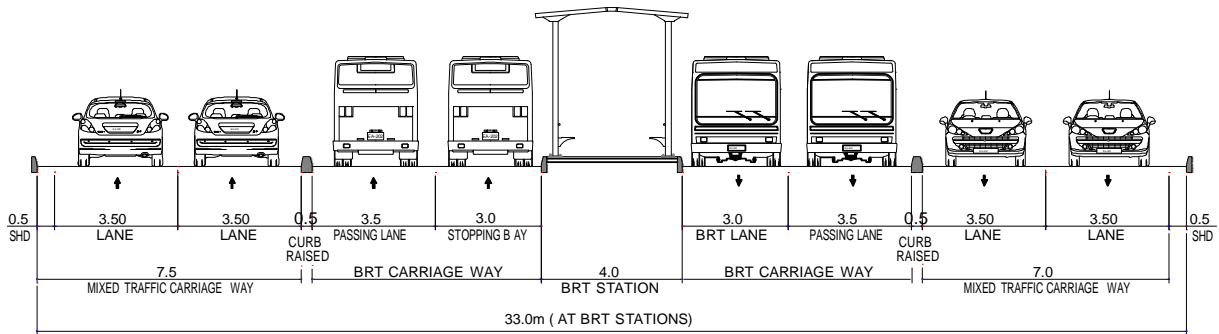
shows the cross section at station with passing lanes for both sides. The station is wide enough for both boarding and alighting with 4m width. Parking lanes are provided for both sides of carriageways. The road with one-lane for mixed traffic is not recommended as a BRT corridor. Therefore, at least two lanes for one direction are necessary. The road width excluding pedestrian walks is 37m. Only North Nazimabad, New Karachi and a part of University Road have enough space to satisfy this width. However, after the analysis of the corridors, it was decided that passing lanes would not be provided at the BRT stations because of limited spaces of roads.
